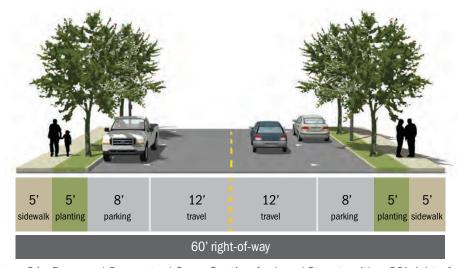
Proposed Conceptual Cross-Section for Local Streets with a 60' right of way
